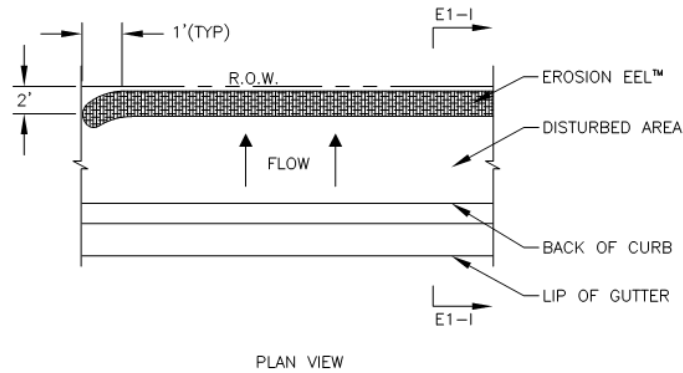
F: PLAN VIEW - TYPICAL ARRANGEMENT OF EELS USED FOR PERIMETER CONTROL
